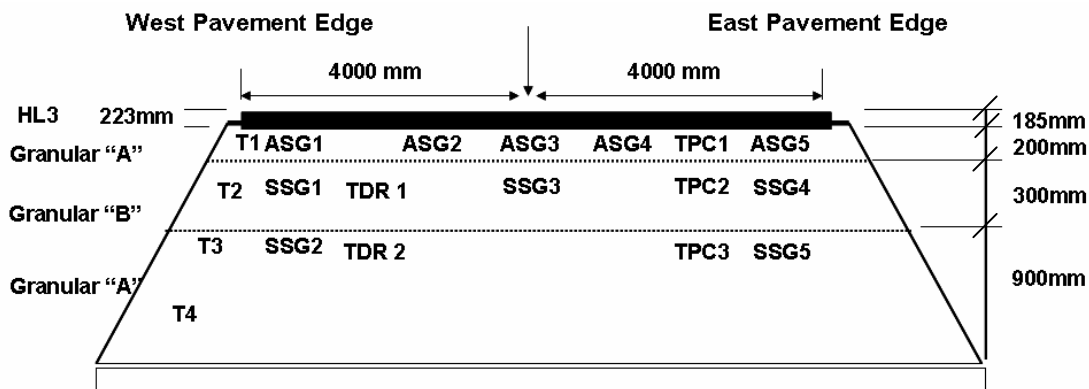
Instrumented Section Profile and Sensor Distribution Layout
